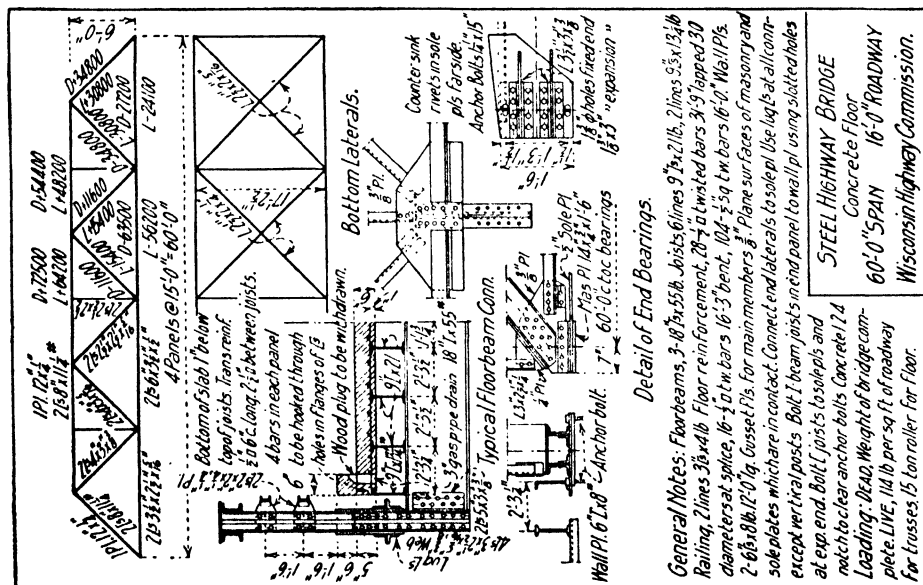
LOW TRUSS STEEL HIGHWAY BRIDGE.
